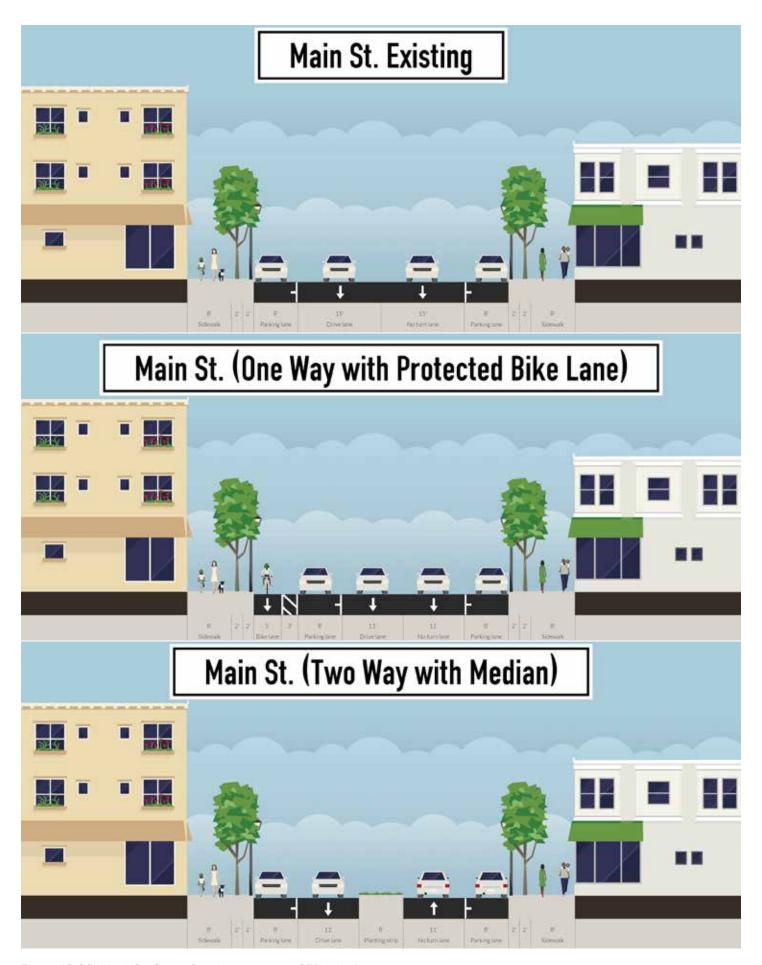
Main St. Cross Sections, source: SERA Architects
